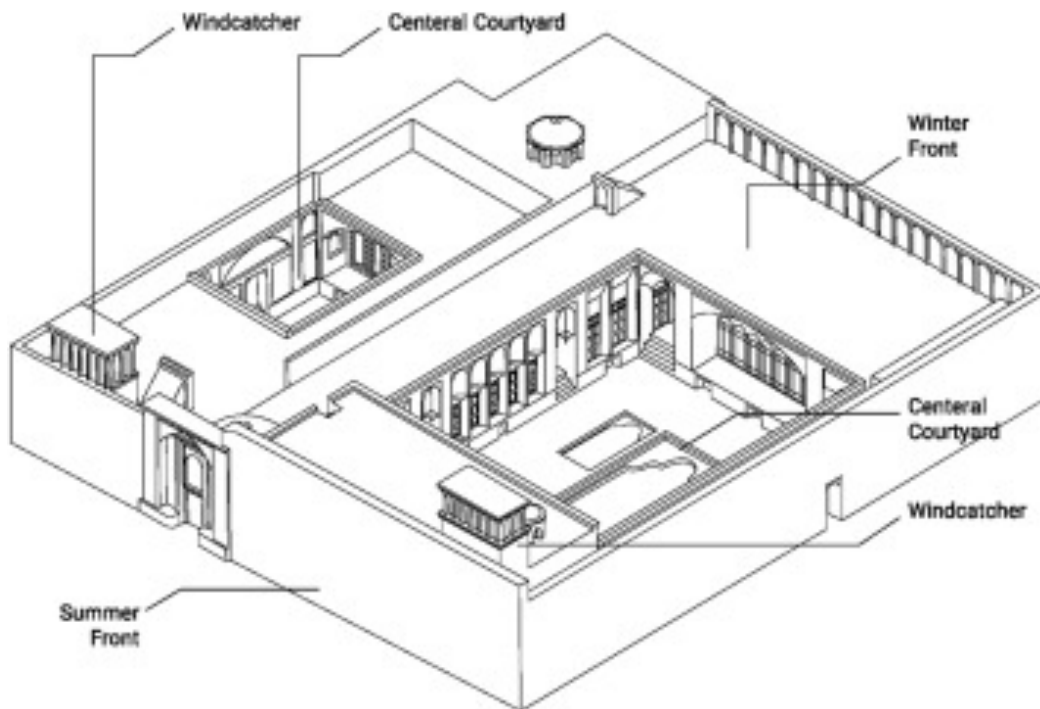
Rasoulia house: an example of an inward-looking courtyard house with windowless walls fronting the street in Yazd, Iran. (Source: Haji Ghasemi, 1996).
